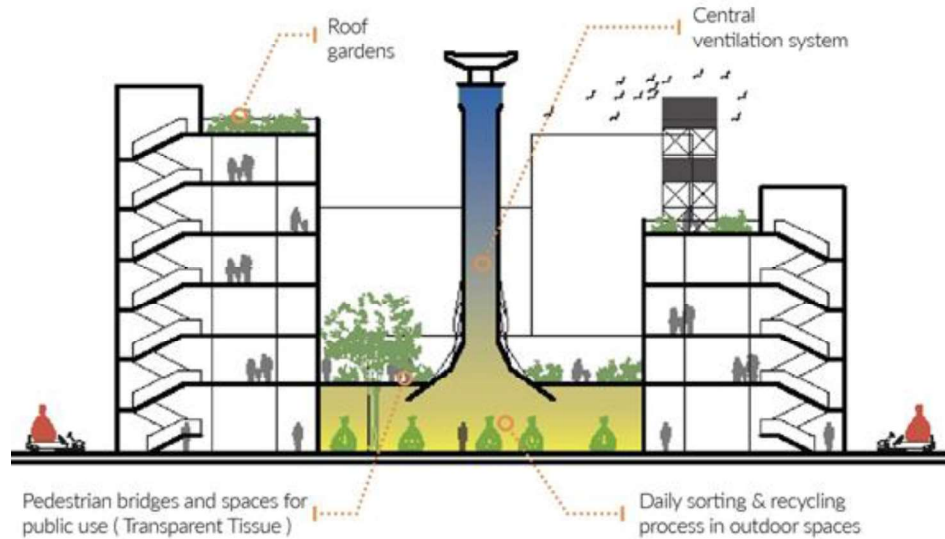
Indoor recycling approach as a proposed urban upgrading model (By Authors)
